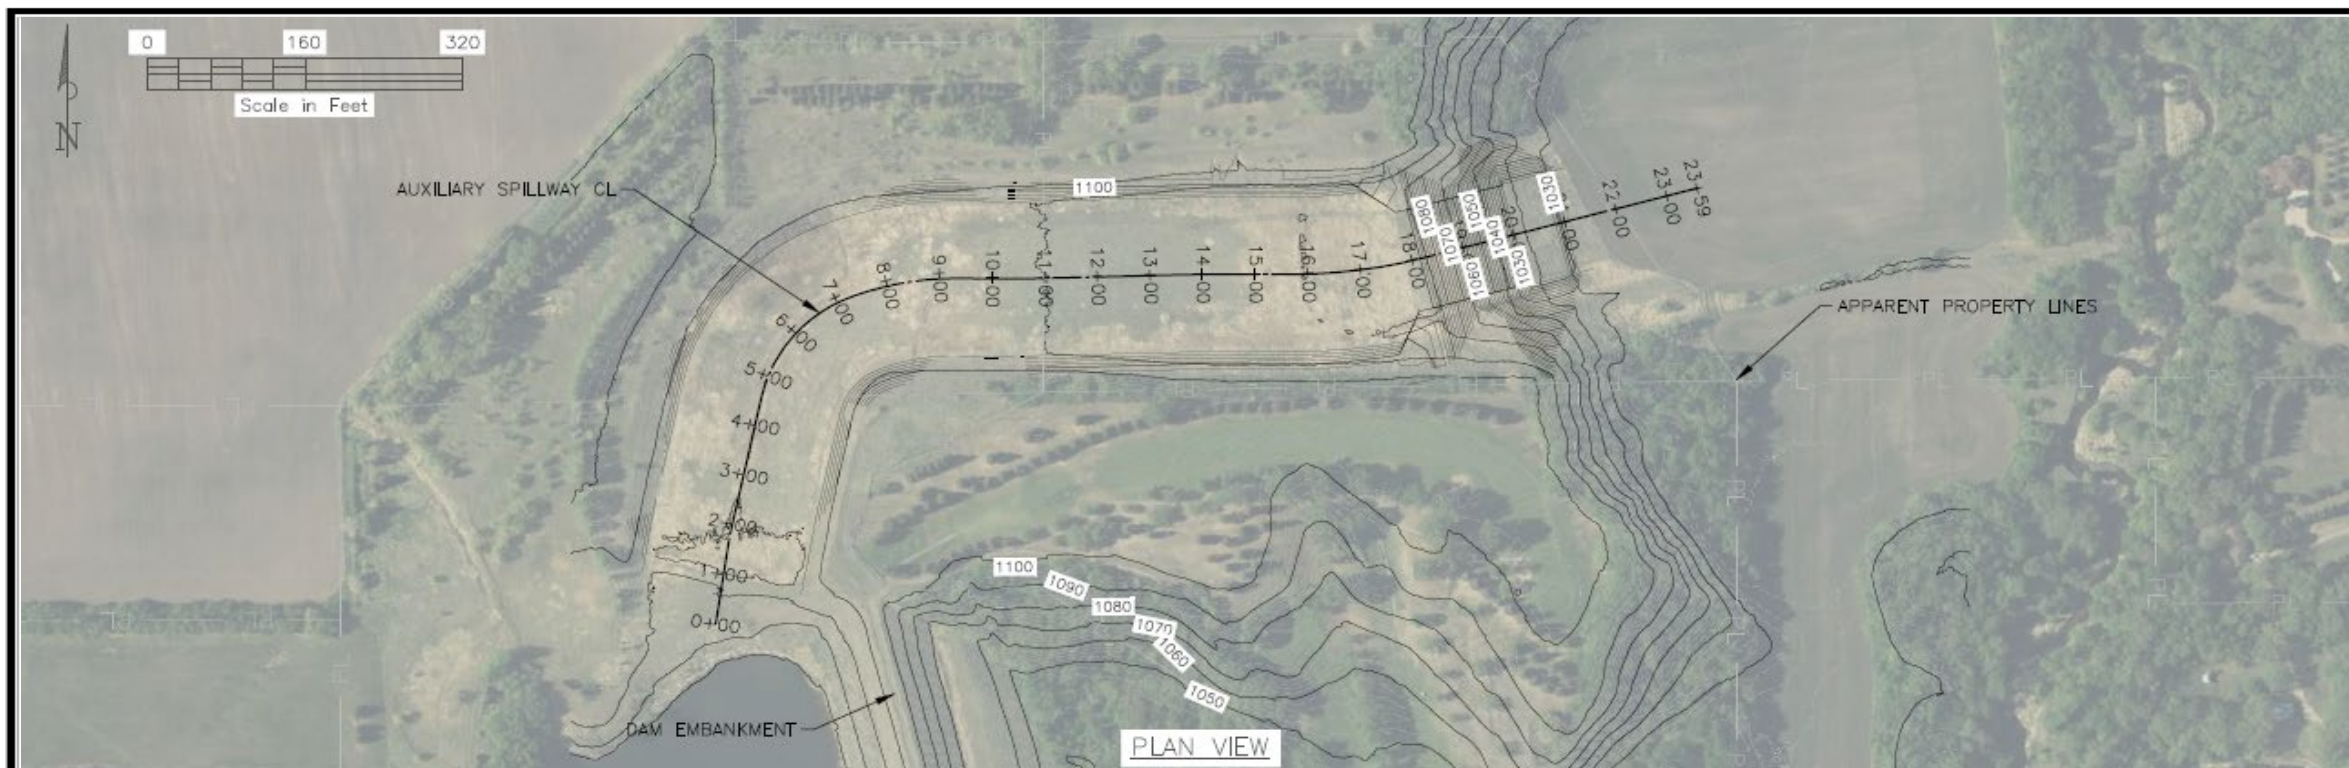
Alternative 6: Structural Chute Plan and Profile - Current Auxiliary Spillway
